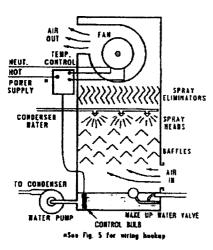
Wiring hookup and installation of the A28MA-1 Cooling Tower Fan Control with a forced draft cooling tower.
